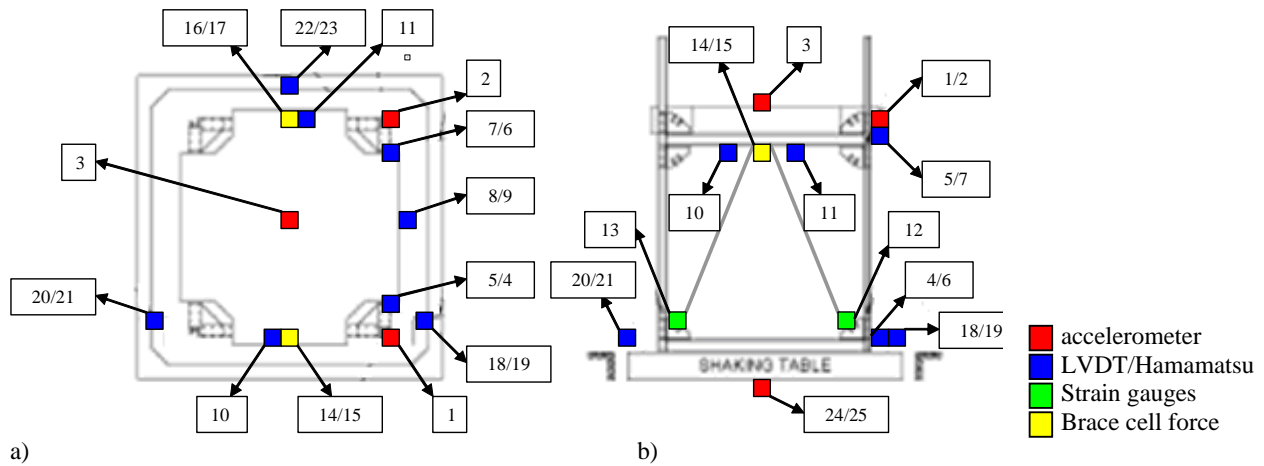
Instrumentation set-up of SPECIMENS II and III at LNEC: a) Plan view and b) Elevation.
